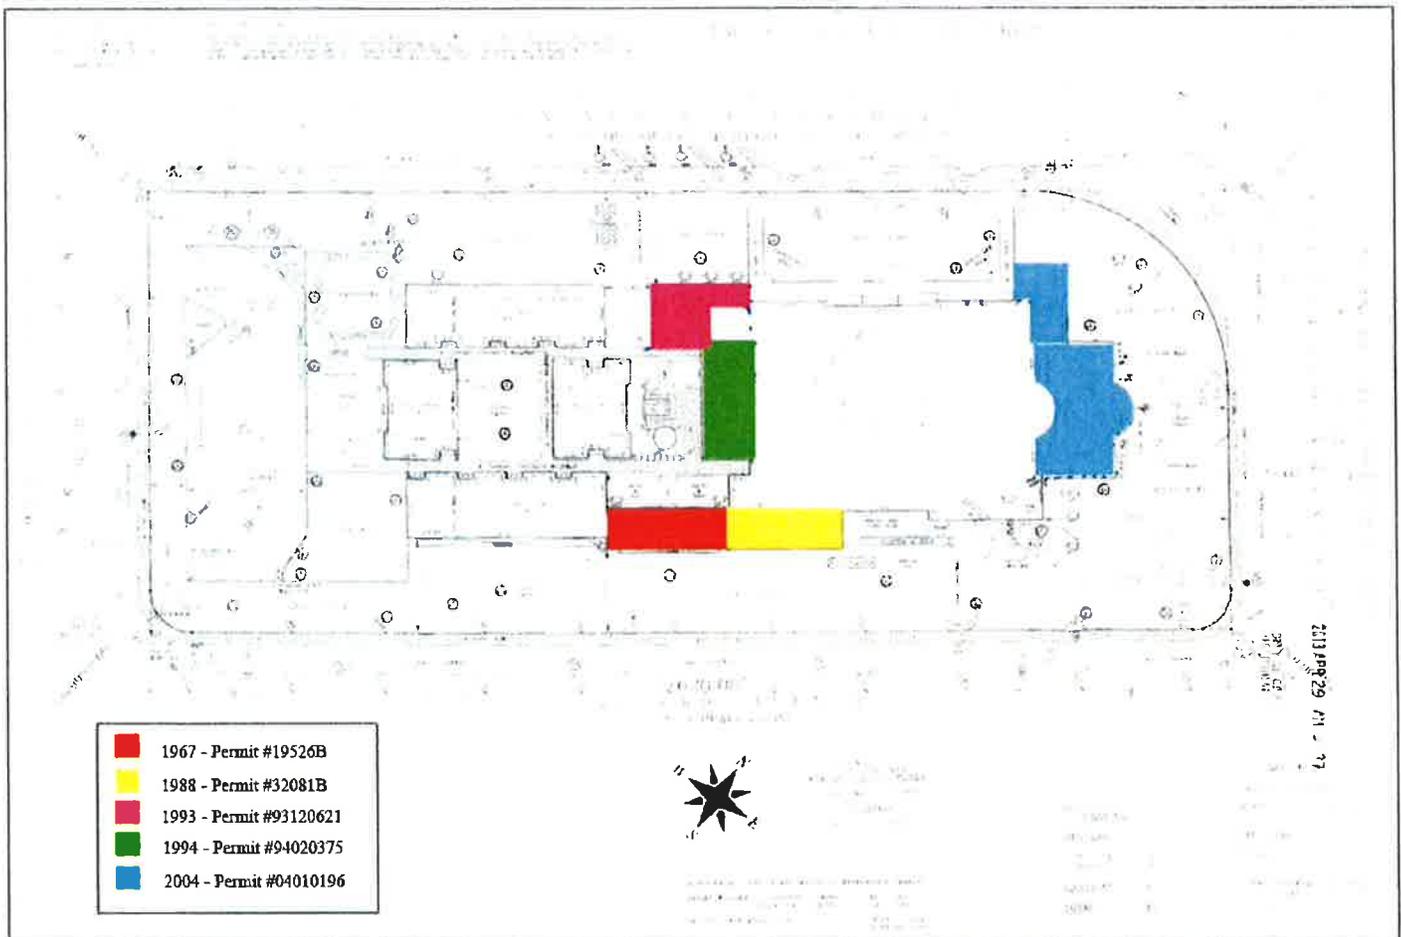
Schematic Depiction of Additions to Temple Judea on Current Site Plan
